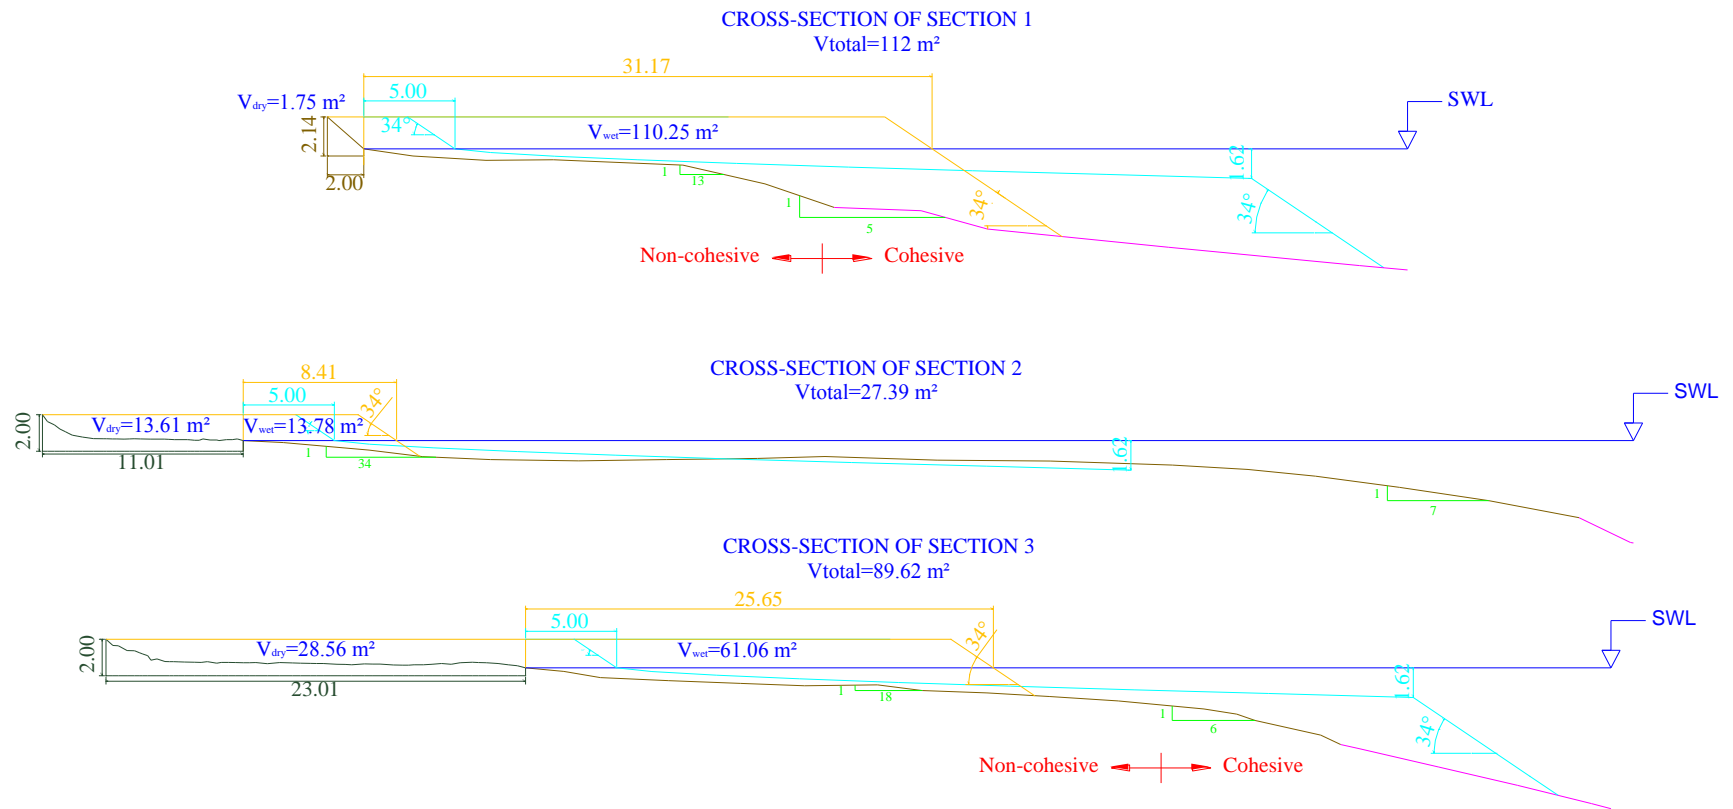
Design profiles of Section 1,2 and 3 for 5 m new dry beach width ($D_{fill}=0.32 \text{ mm}$).
